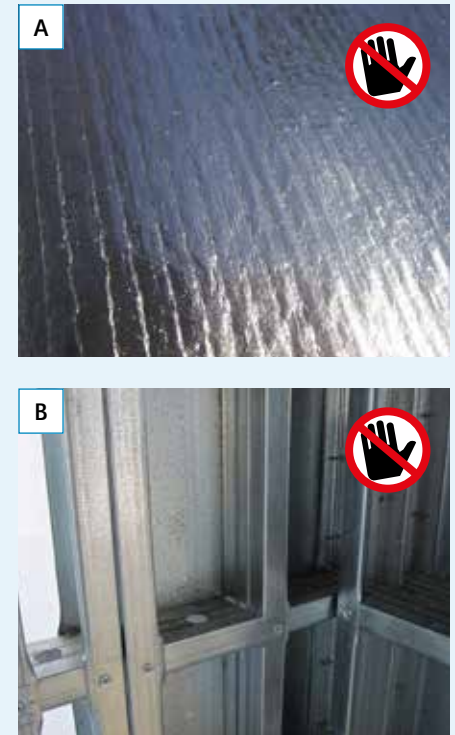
A: Aluminium foil; B: Metal sheet bracing
